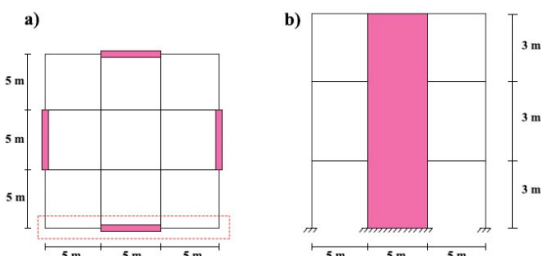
The schematic view of the dual system models; a) plan; b) elevation
